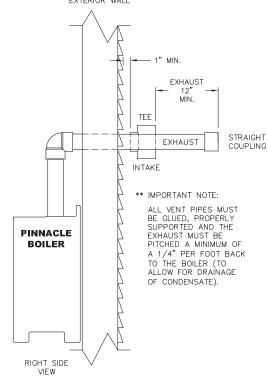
PI-T50 & PI-T80 Sidewall Venting with 2" Pipe (Exhaust Termination at Higher Elevation than Air Intake).
